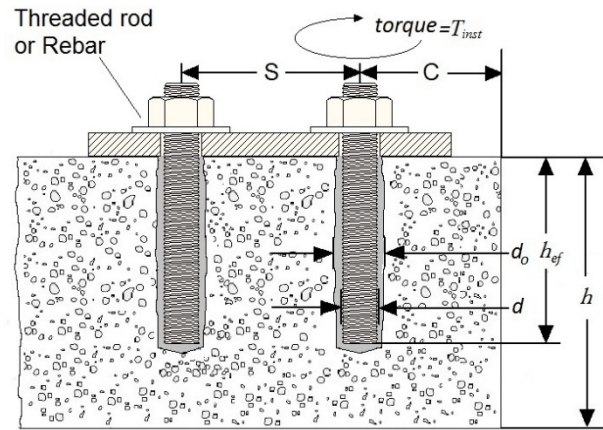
TYPICAL INSTALLATION DETAIL FOR THREADED RODS AND REINFORCING BARS
